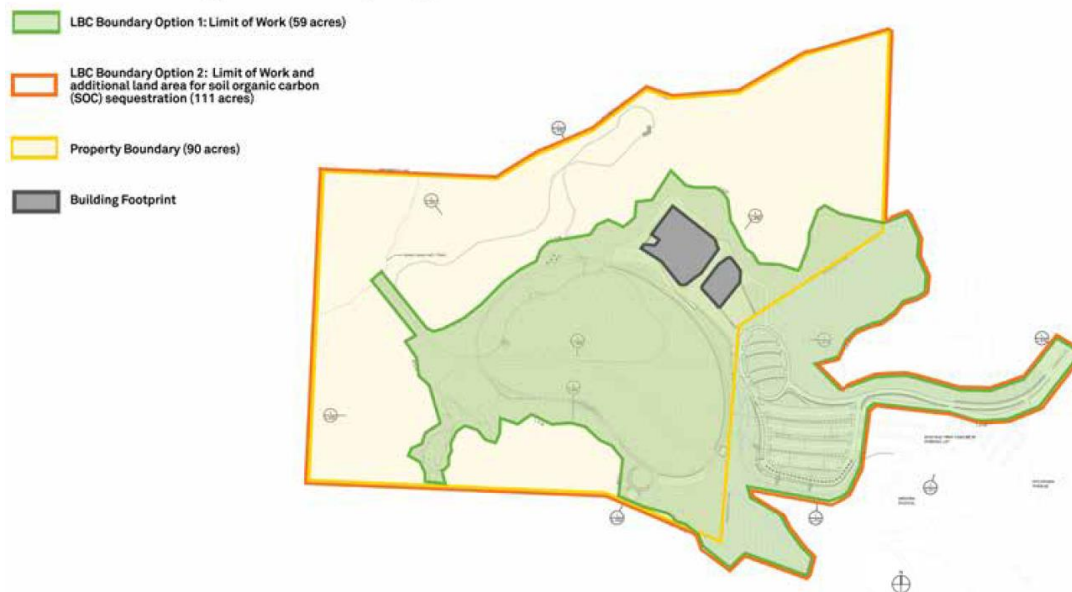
TRPL Site Living Building Challenge, Proposed Project Boundary
